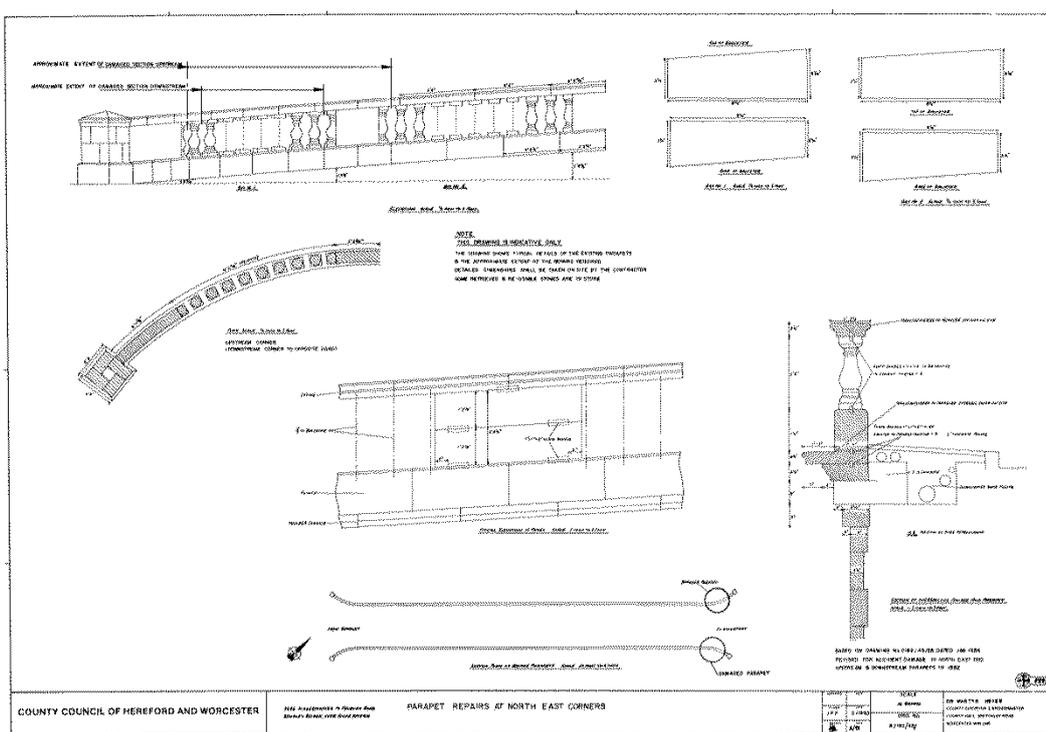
1993 plan of the north parapet, scheduling some replacement and detailing the area of damage.
